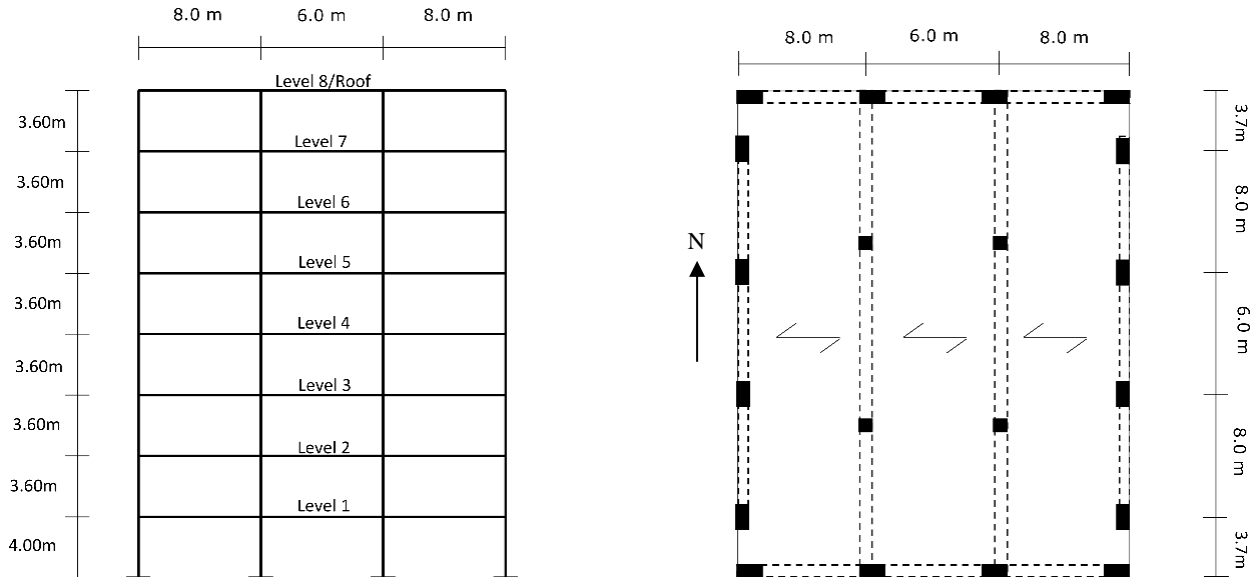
Frame elevation (left) and building plan (right) views of the eight-storey case study RC frame building.
